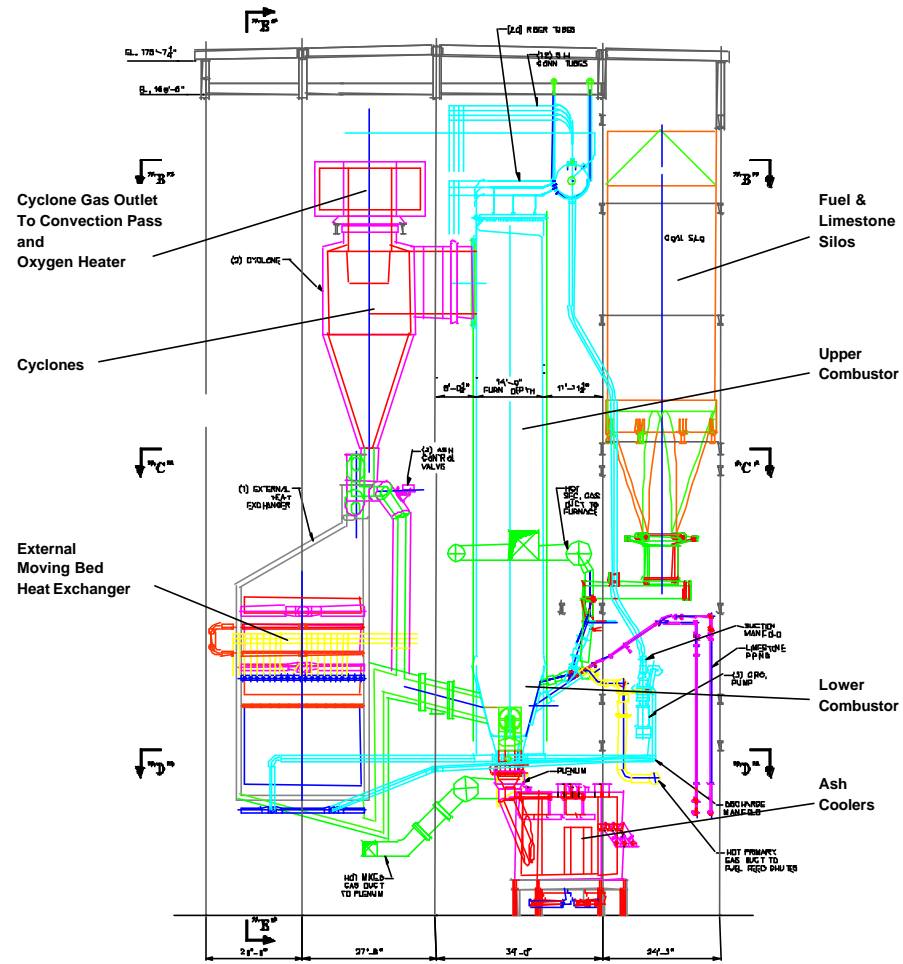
3: Case-2 Boiler Island General Arrangement Drawing – Side Elevation
